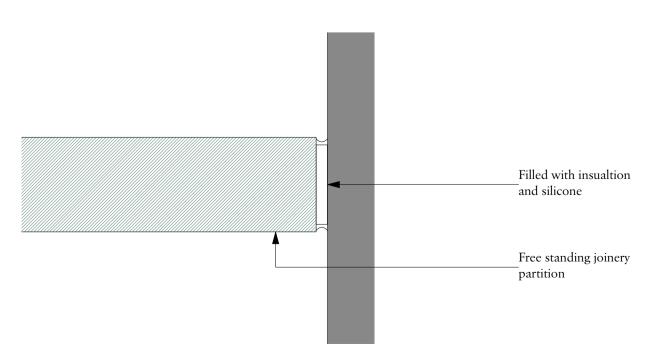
CORNICE - SCRIBED PARTITION 1-5 ELEVATION VIEW
